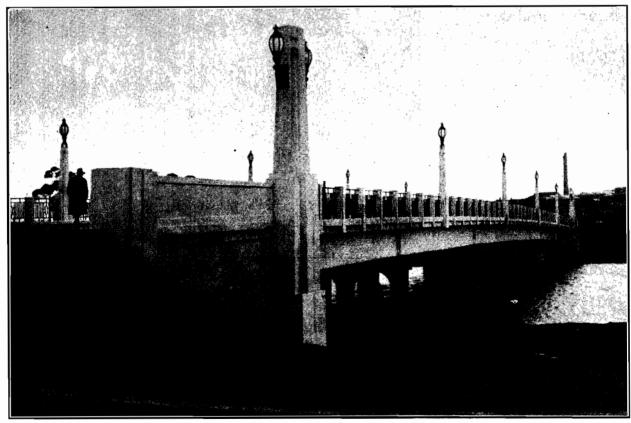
Showing completed bridge over the Maribyrnong River on the Ballarat Road.
